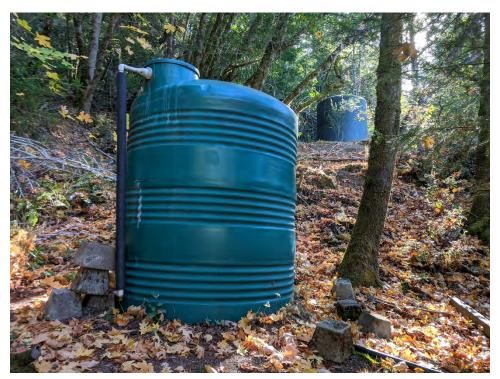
View of additional water storage tanks. Photo taken November 11, 2020.
